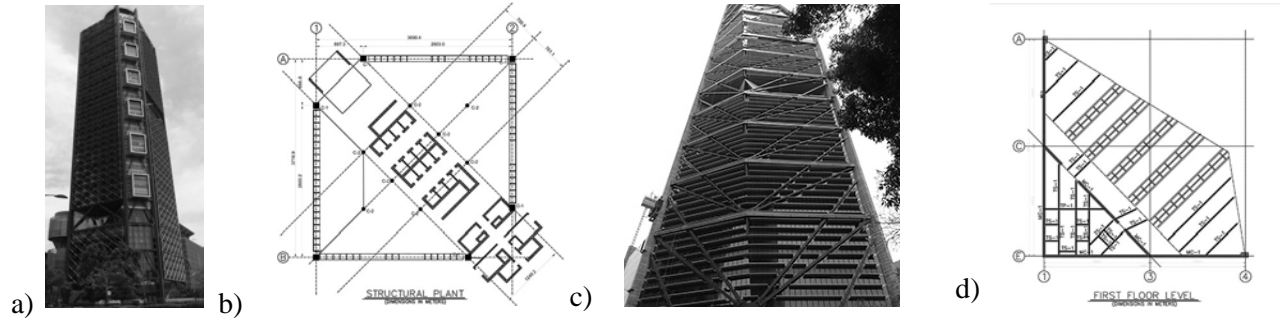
BBVA Building: a) lateral view; b) floor plan; Torre Reforma Building c) lateral view; d) floor plan.
